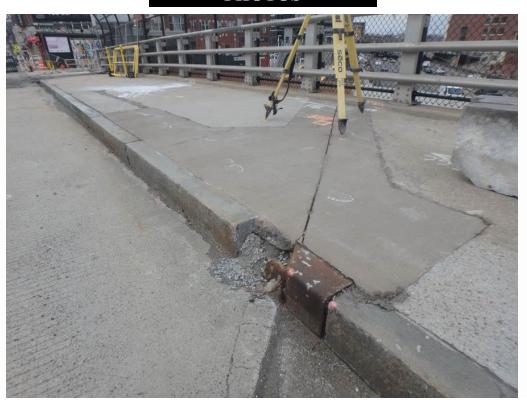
Concrete patch in the west sidewalk at pier #1, small section of granite curb missing
